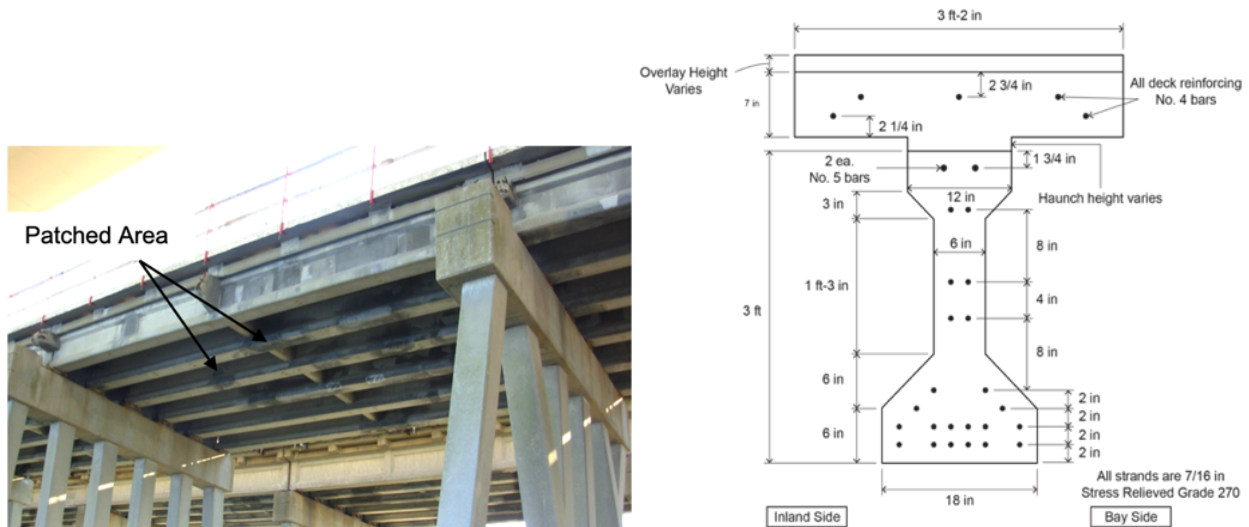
Typical Deterioration on the Lesner Bridge (left) Cross-section of Lesner Bridge I-Beams (Right)
